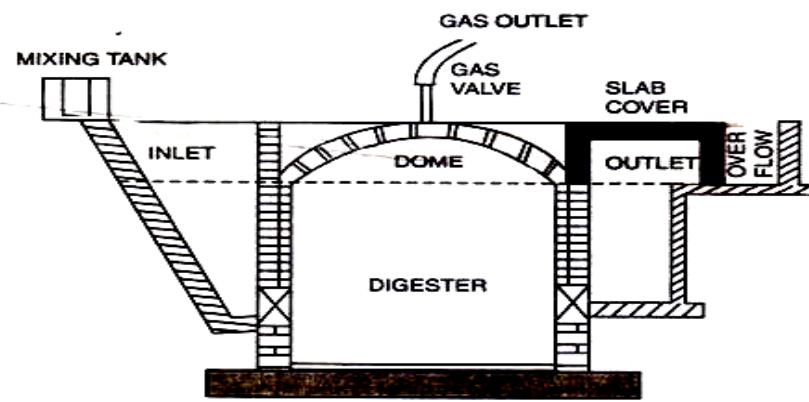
FIXED DOME TYPE BIOGAS PLANT
